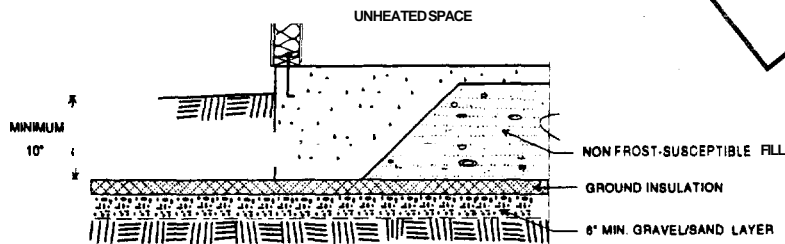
FPSF Design for Unheated Buildings with Insulation in Single Plane.
